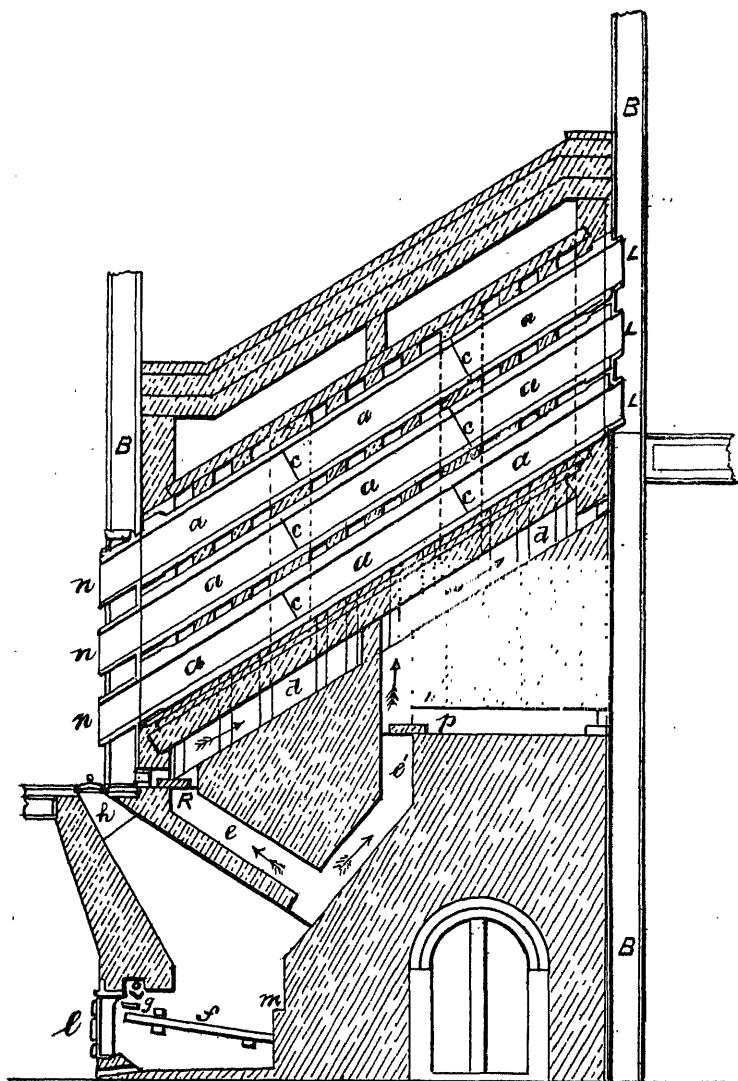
Longitudinal Section of Bench of Inclined Retorts and Gas Producer.
